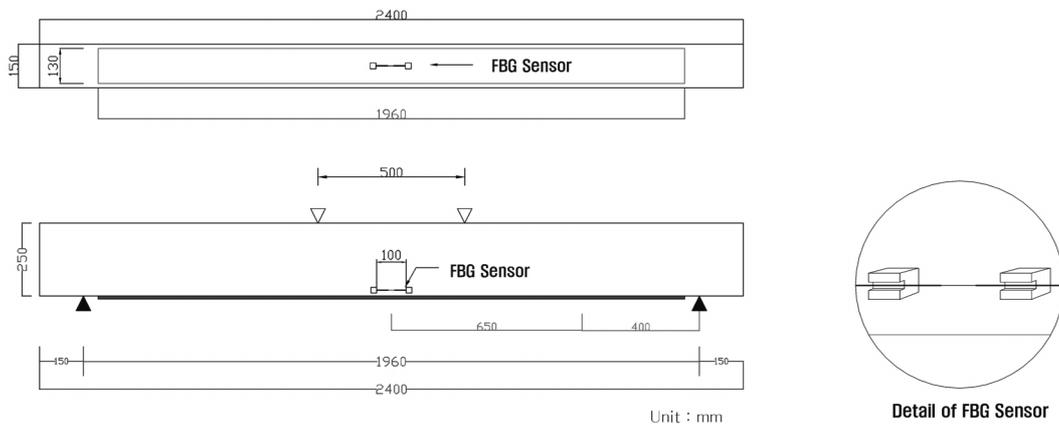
Dimensions of bending test specimens and details of FBG sensors
